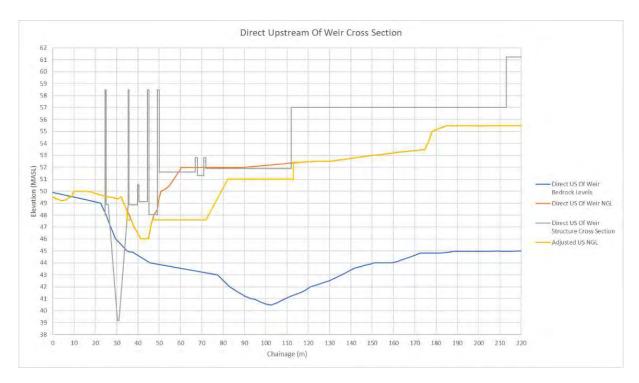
Proposed BRVAS weir sections at the weir viewed looking downstream
